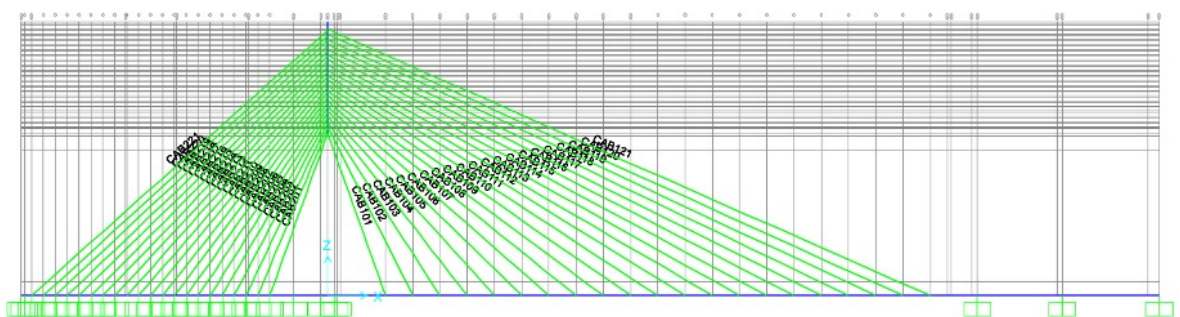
Cable arrangement of New Kömürhan Bridge in FEM.
